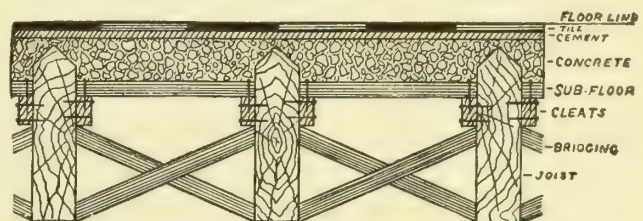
CONSTRUCTION FOR TILE IN OLD BUILDING
